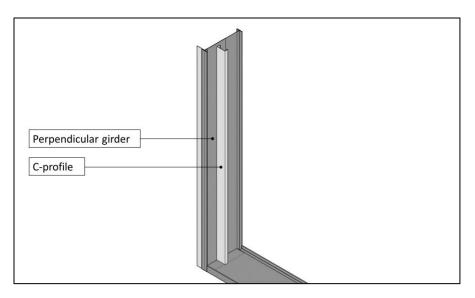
Isometric view of element zoomed in, without trapezoidal sheet
